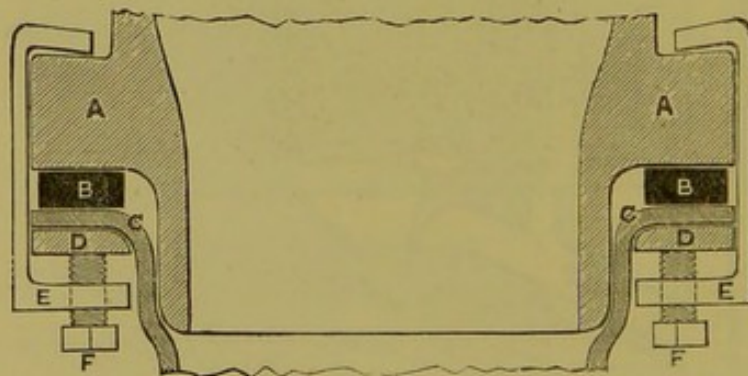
A.—Section of Jointing of Earthenware to Lead.
